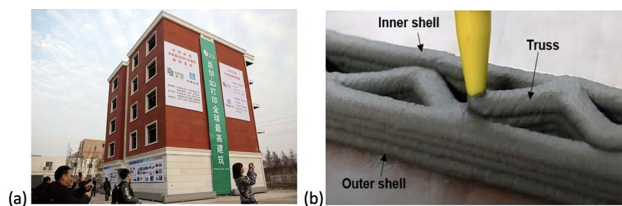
A sample of concrete printing structure. a Five-storey 3D printed building in Suzhou, China. b Image showing the construction of the building using concrete printing. The building was constructed using a gantry system. It was built using prefabricated blocks that were printed offsite and assembled at the construction location (Yossef and Chen 2015)
